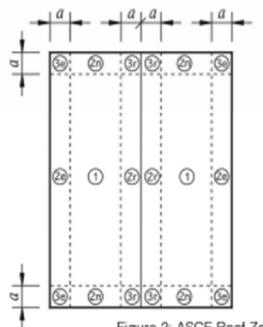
ASCE Roof Zone Locations for Gable Roofs
